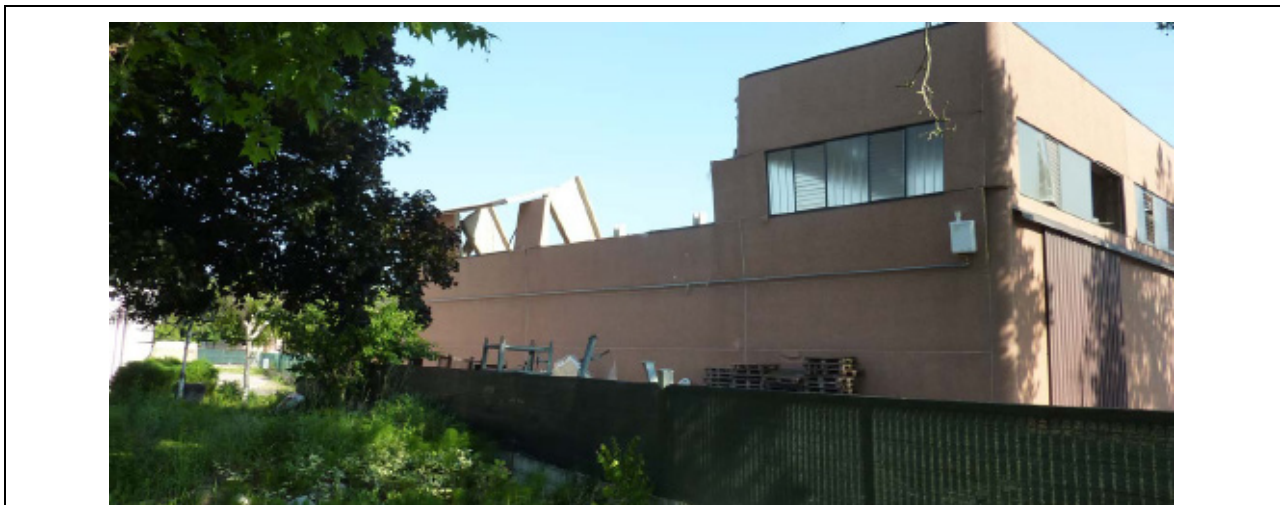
Recent industrial shed with horizontal panels connected to the pillars
